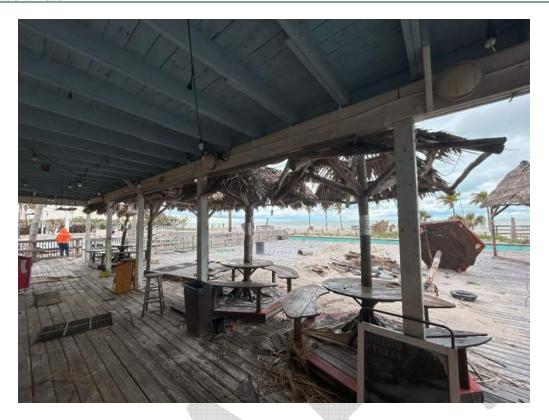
Outside View of the Rear Wood Deck and Back Porch that was Impacted by Outside Tikis.
